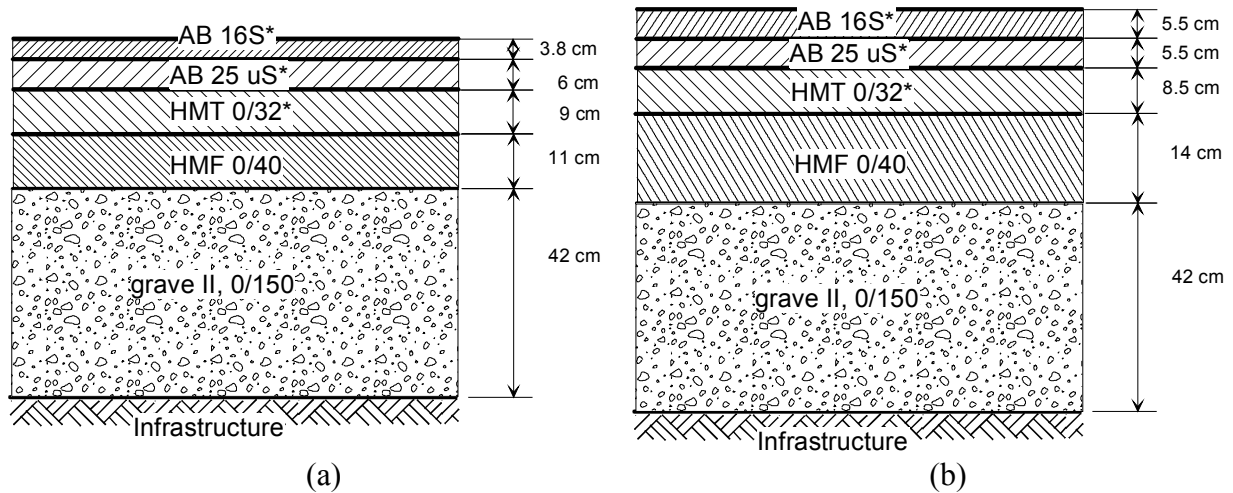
Pavement structure for the test sections (a) and the regular section (b).
